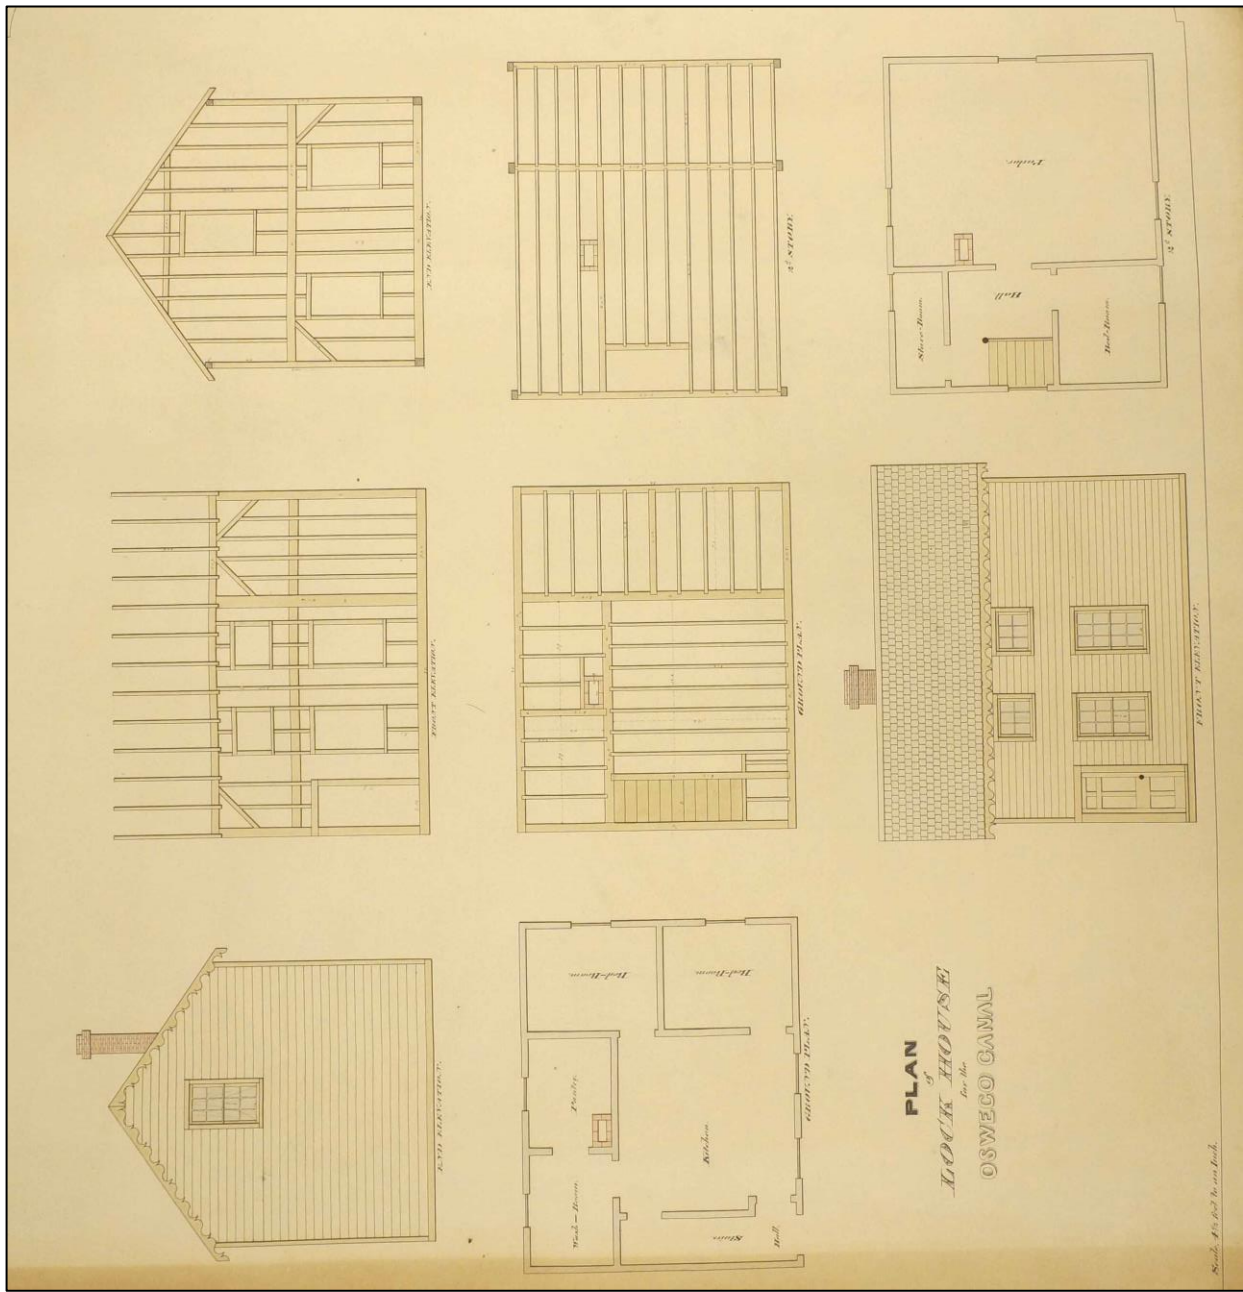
Plans for lock houses on the Oswego Canal, c1855 (New York State Archives).
